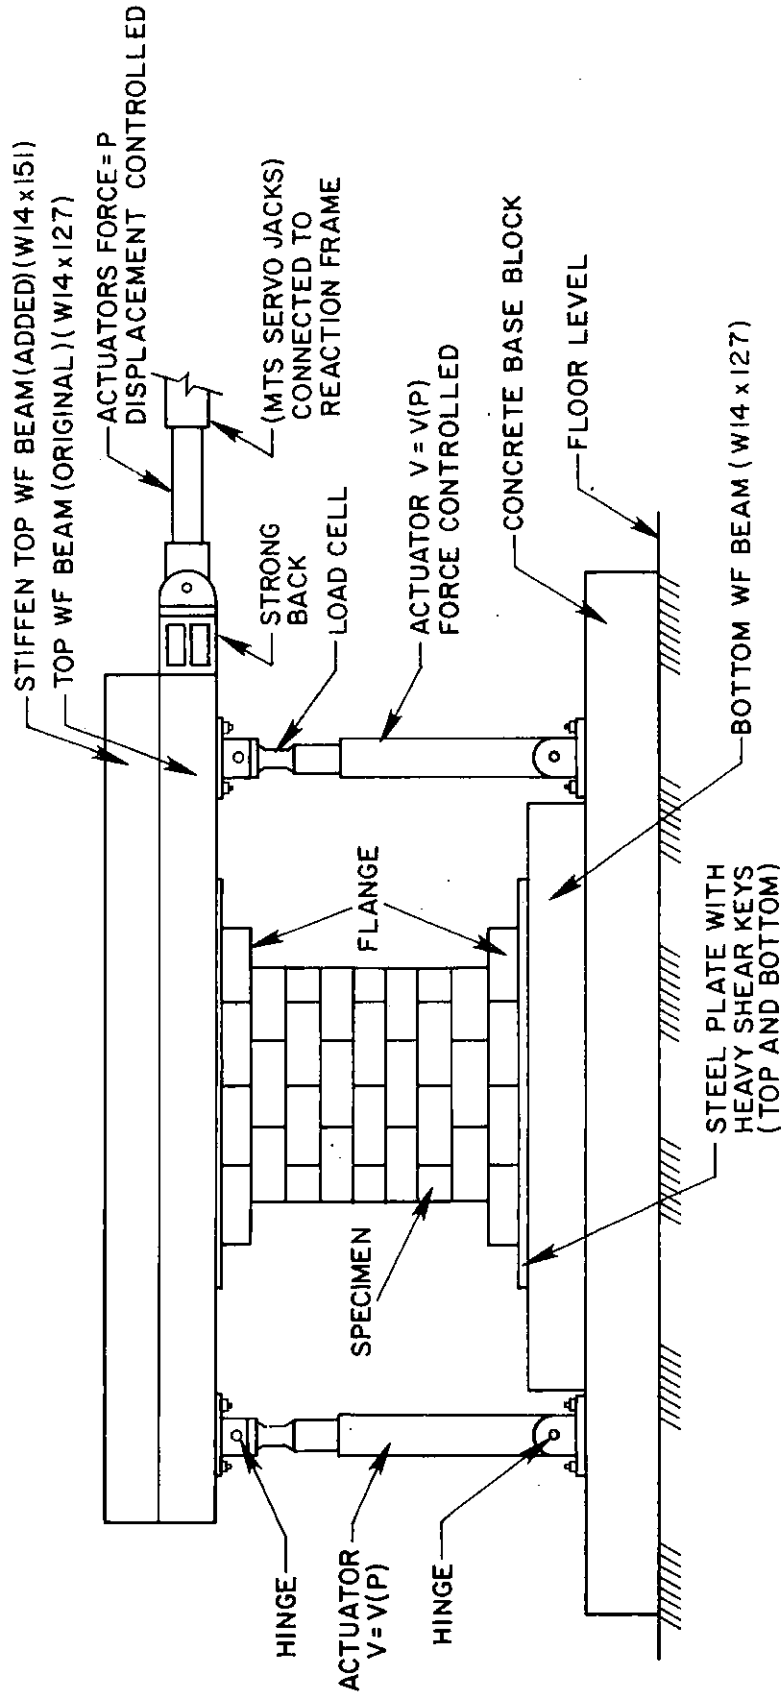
MODIFIED SINGLE PIER TEST SETUP
